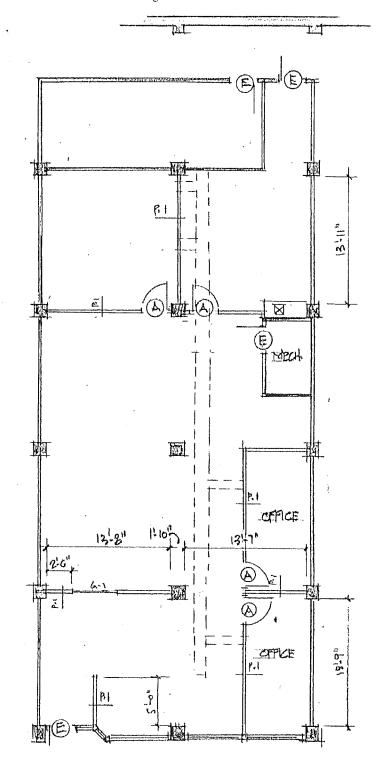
Exhibit C: Tenant Finish Improvements Plan by Landlord Walls, doors and glass panels as shown on plan
